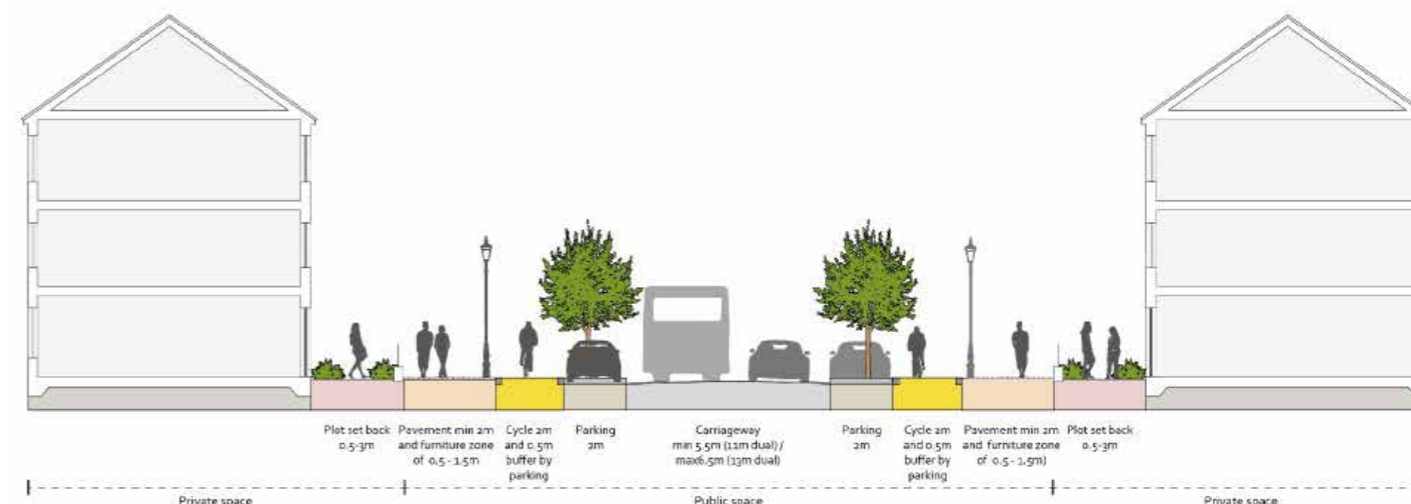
Avenue street section from Healthy Streets for Surrey Design Guide
